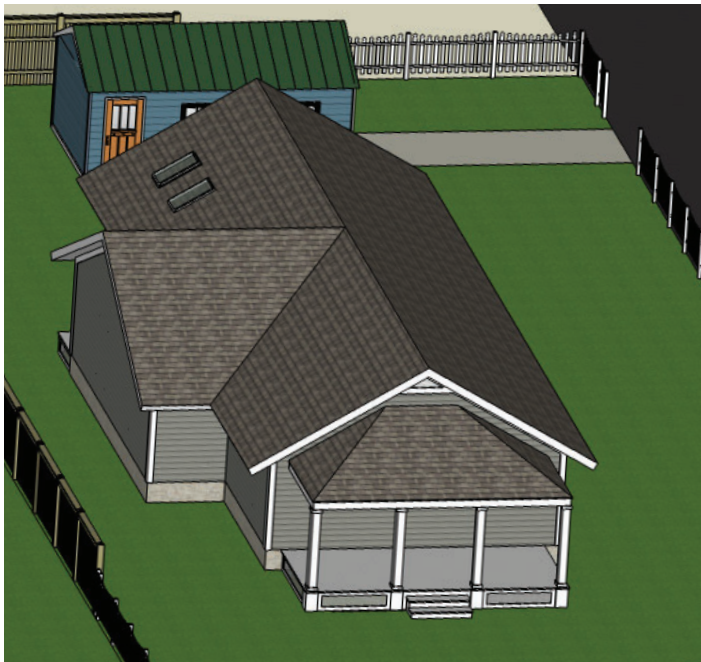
An example of skylights that could be approved on a house on a corner lot. The skylights are located on a non-visible roof slope/elevation and placed behind a cross-gable. The skylights have a low profile and do not affect the character-defining features of the dwelling.
